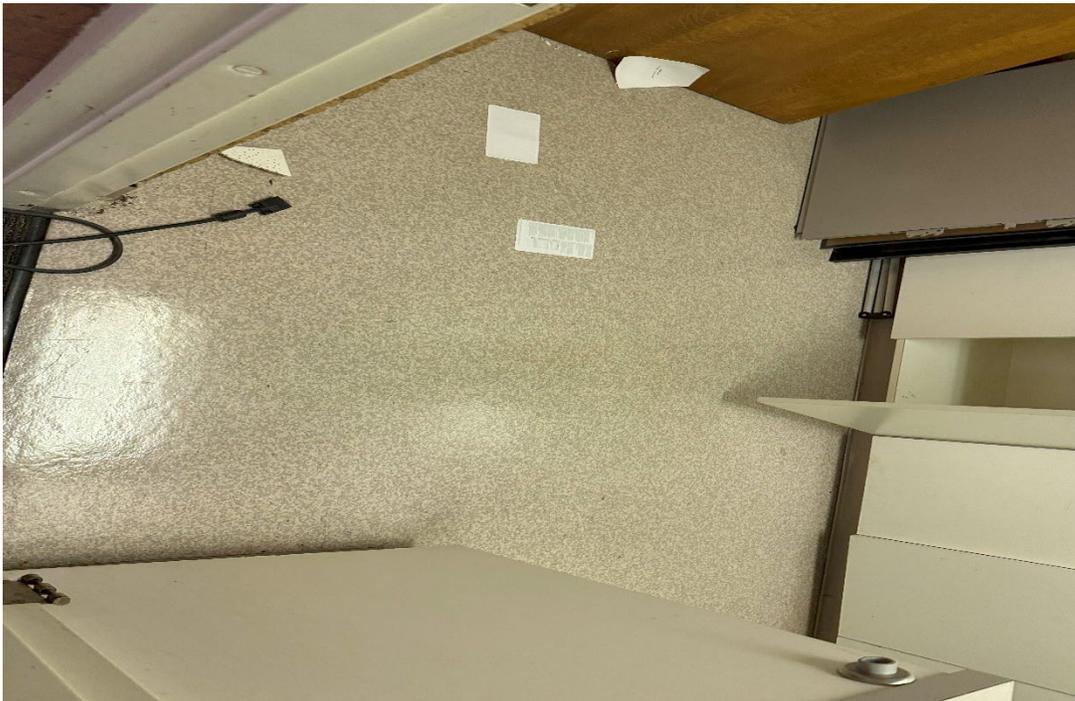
Room 128 B, asbestos containing 12"x12" Off White VFT with mastic on concrete.
